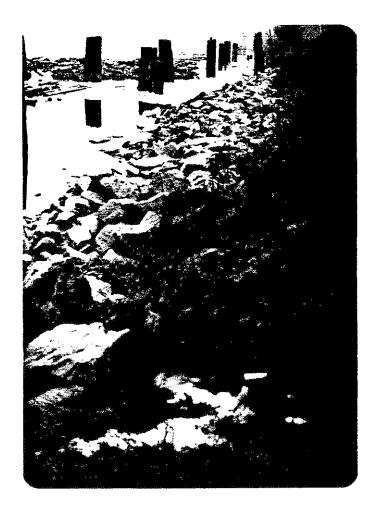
View upstream towards Port Hammond (mill in background). Note riprap which stops well below top of railway embankment. Location approximately Section 21. Also note extent of dolphins and piles along bank.
